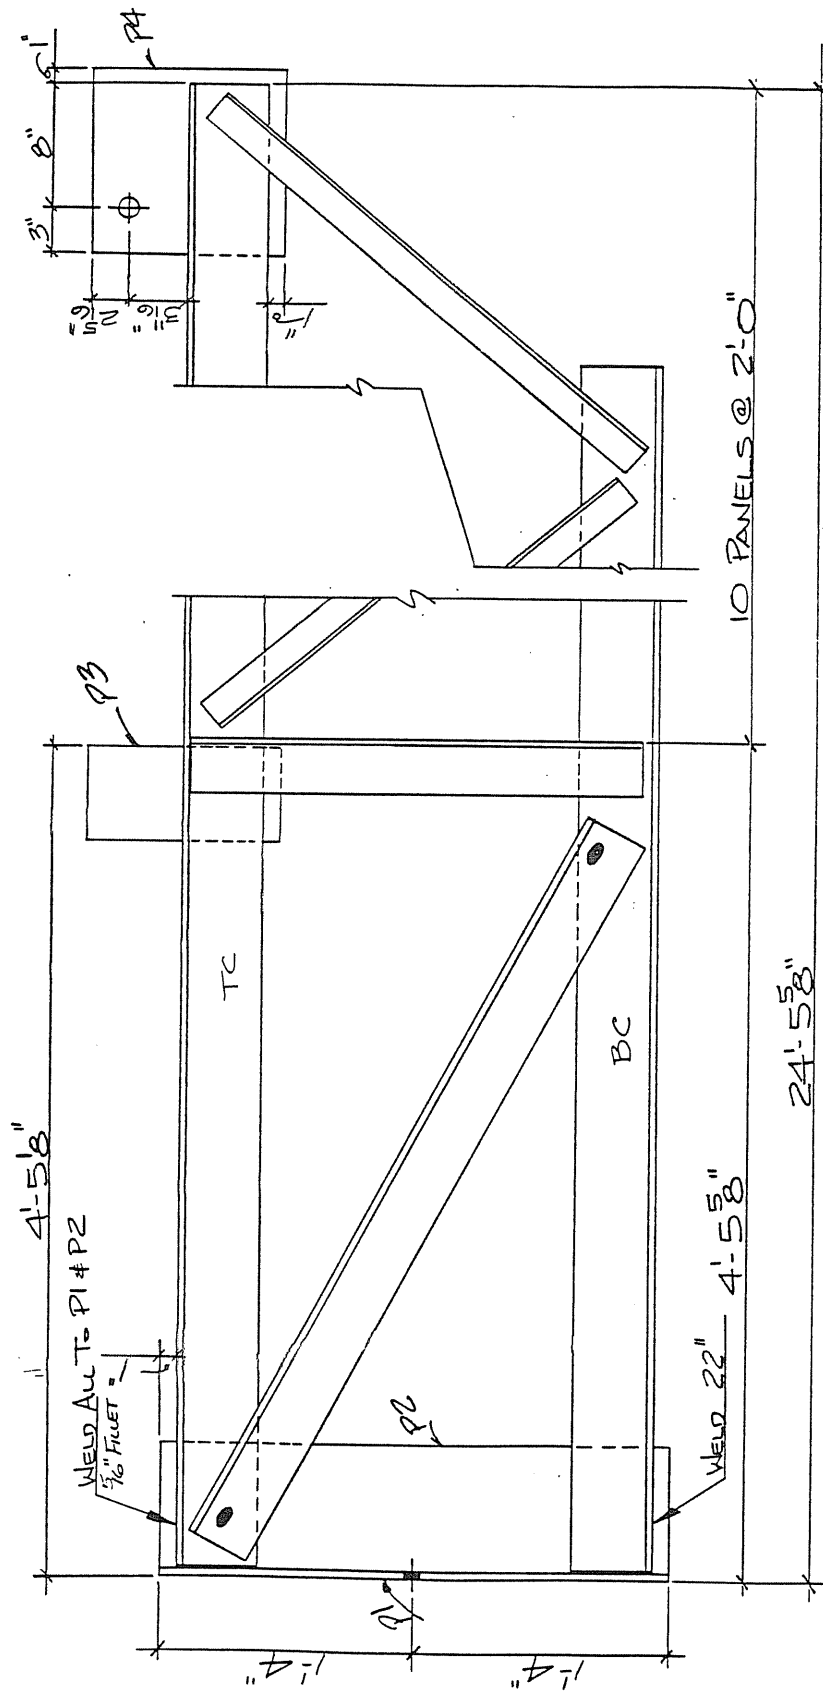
KNIFE CONNECTION DETAIL, TEST KN-6-2
